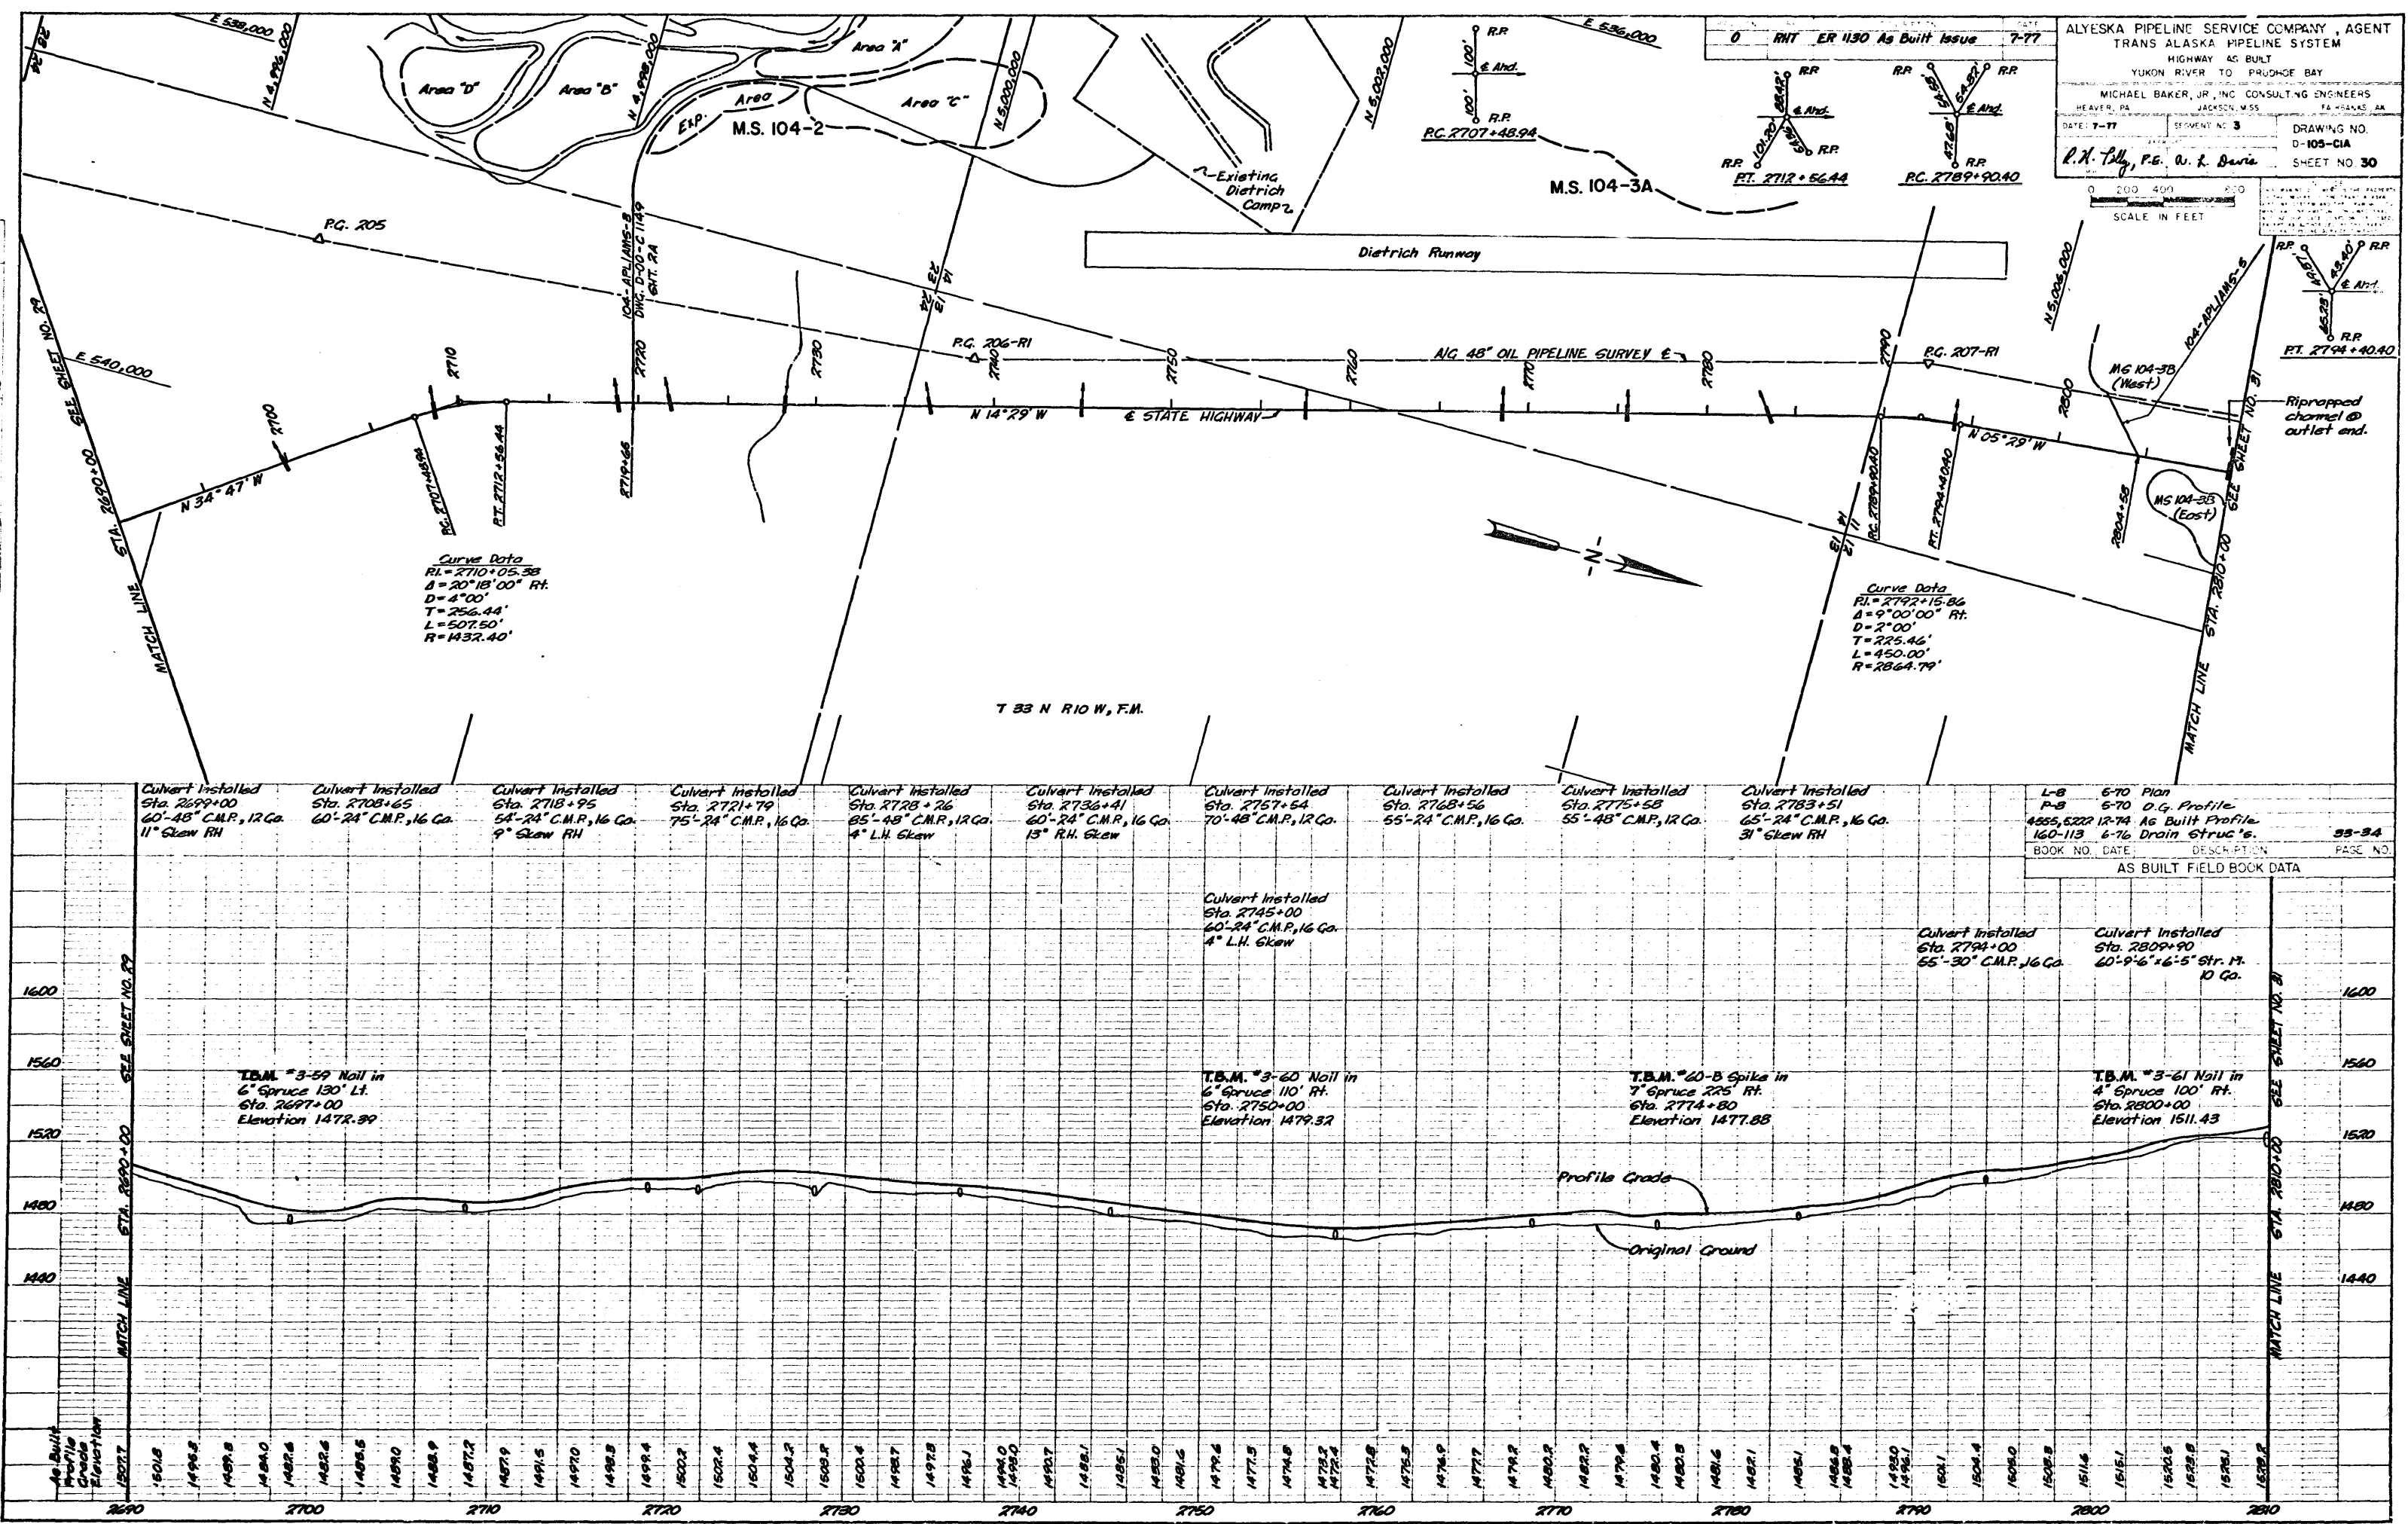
PLAN-PROFILE B.P.R. STANDARD
